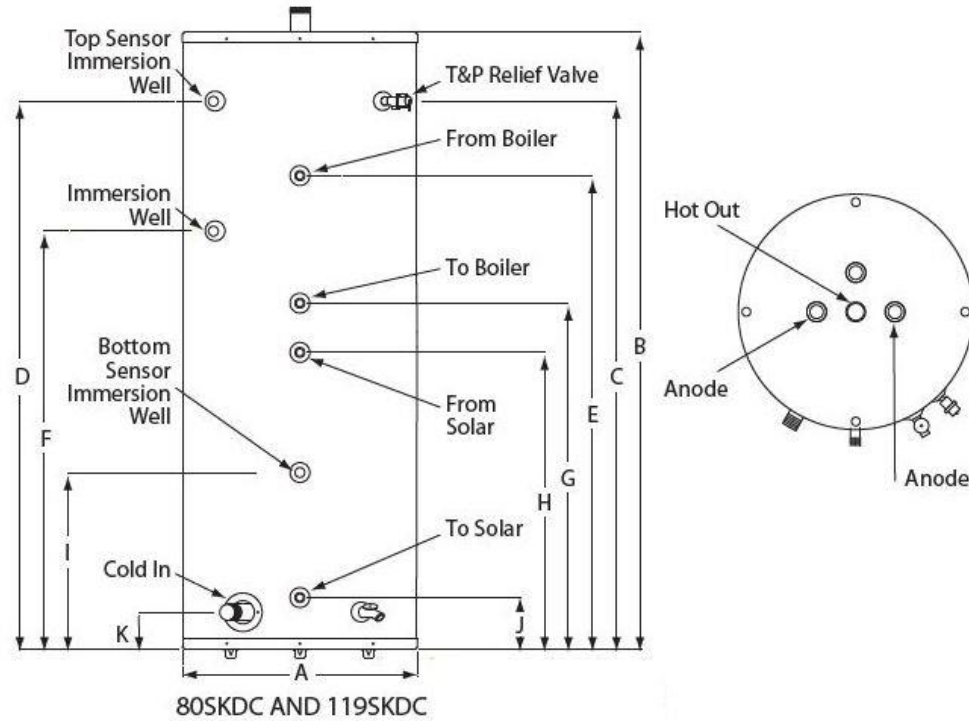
Buffer Storage Tank Dimensional Drawing (Bock Water Heaters 2020)
